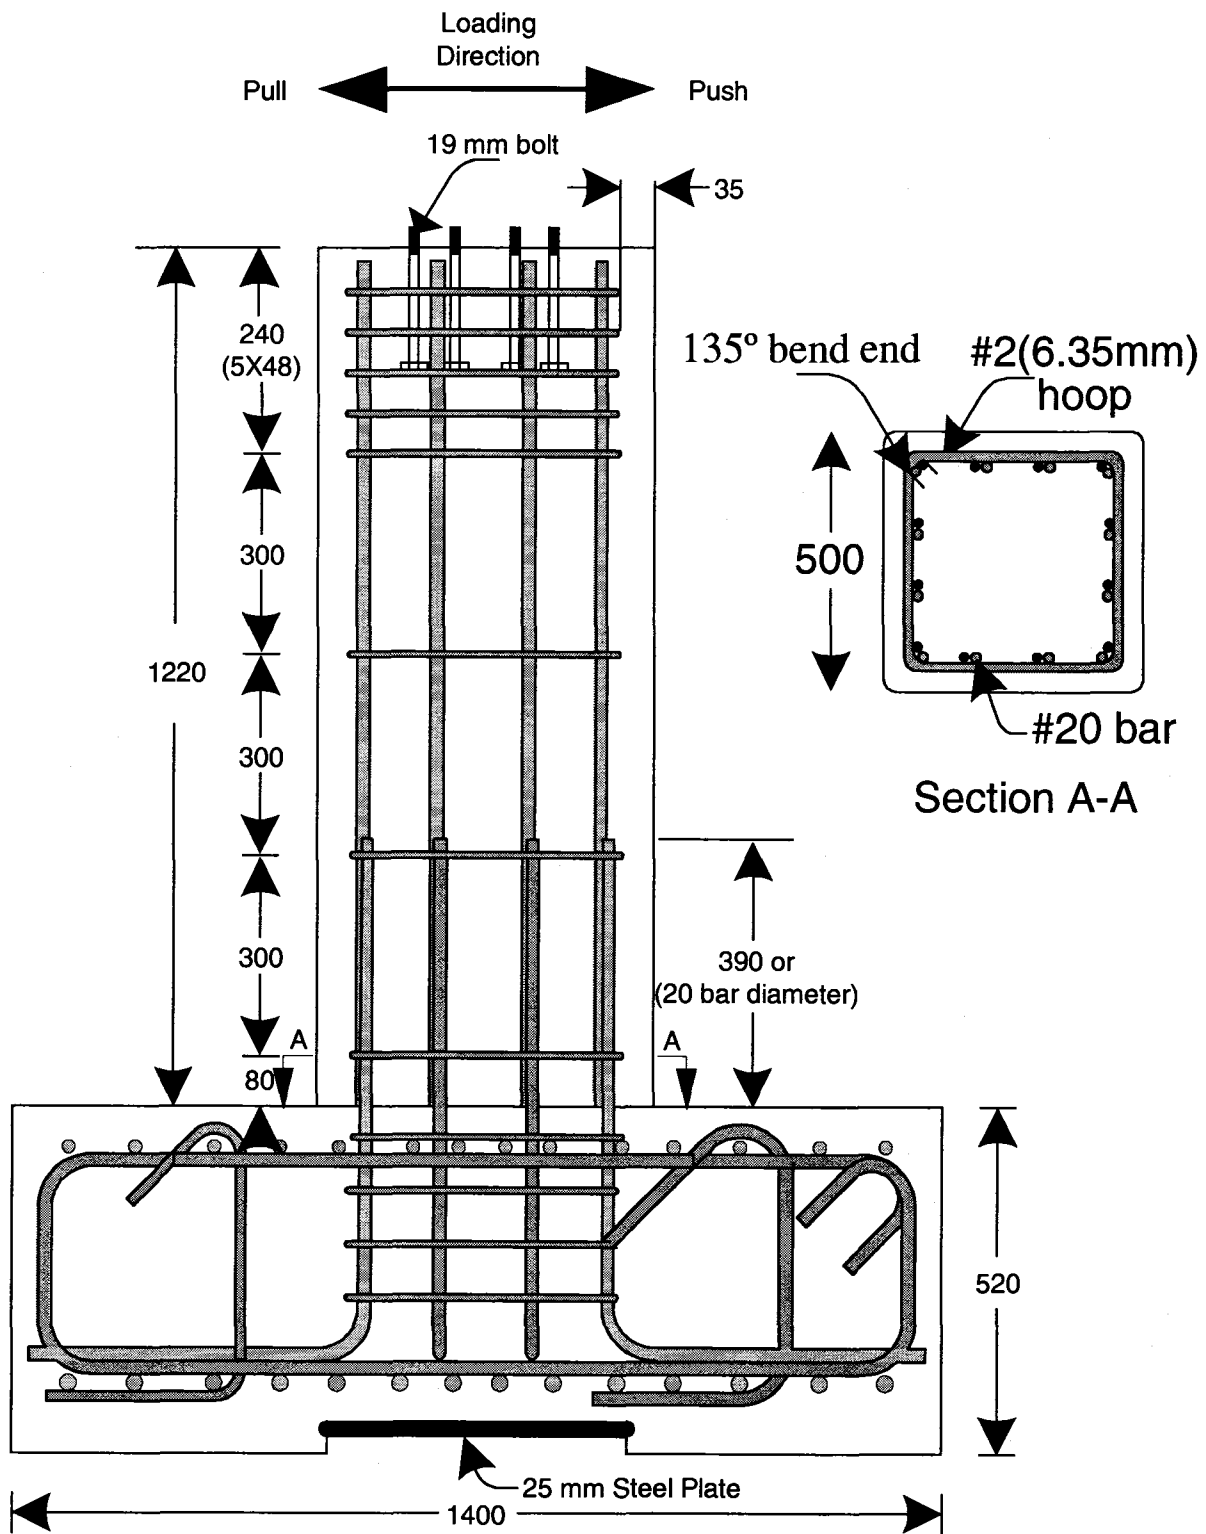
Geometry and reinforcement details for Columns SSR-C and SSR-R
